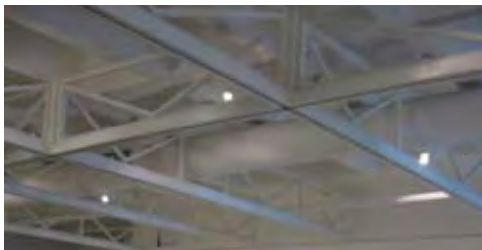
Door sliding track integrated with webbed truss system at the Linda Goodman Gallery
